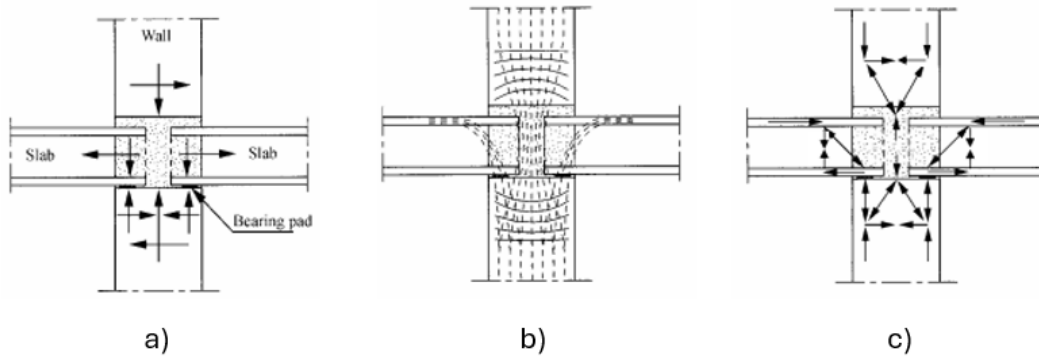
Slab-wall connection a) forces, b) simplified stress analysis, c) strut-tie method (du Béton, 2008)
